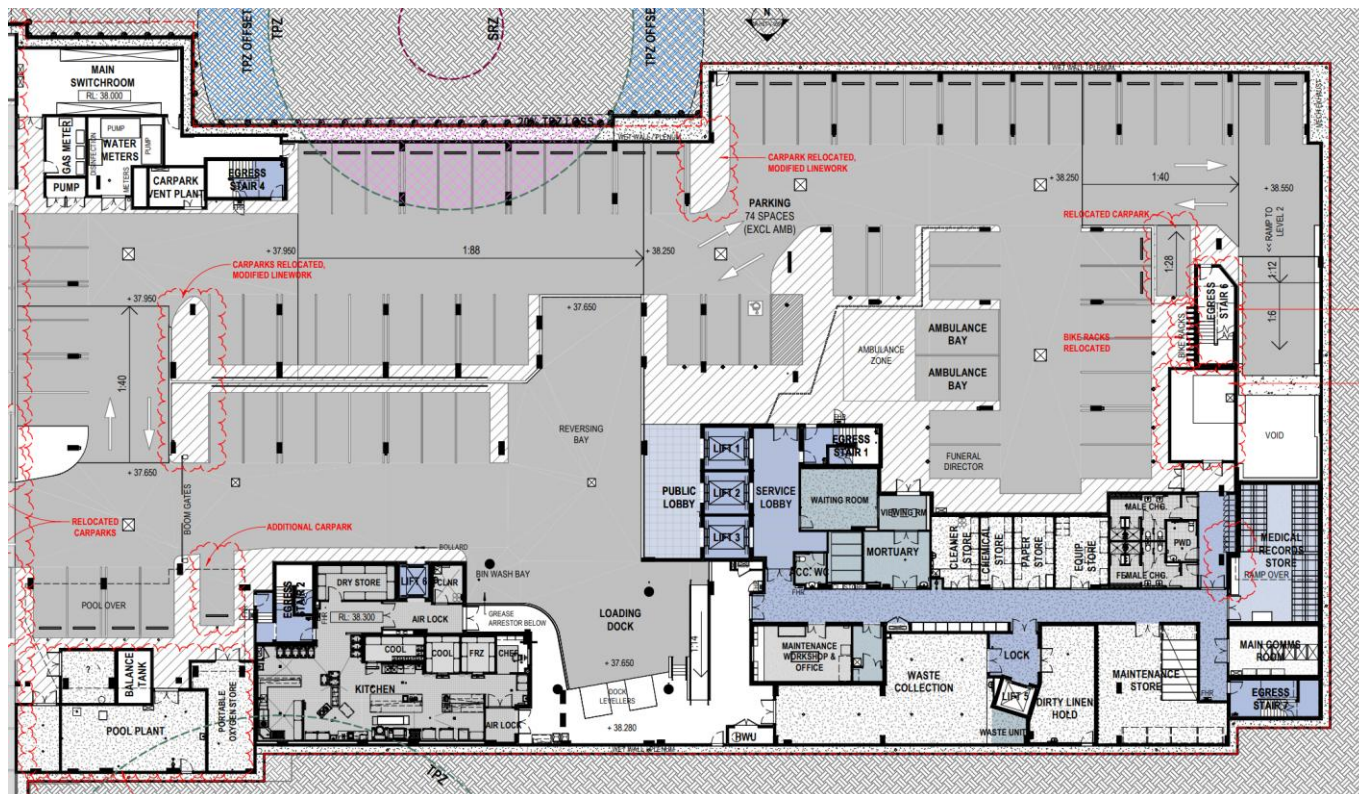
Hospital level 1 basement parking layout, as approved (top, over page) and as proposed to be amended (bottom)
